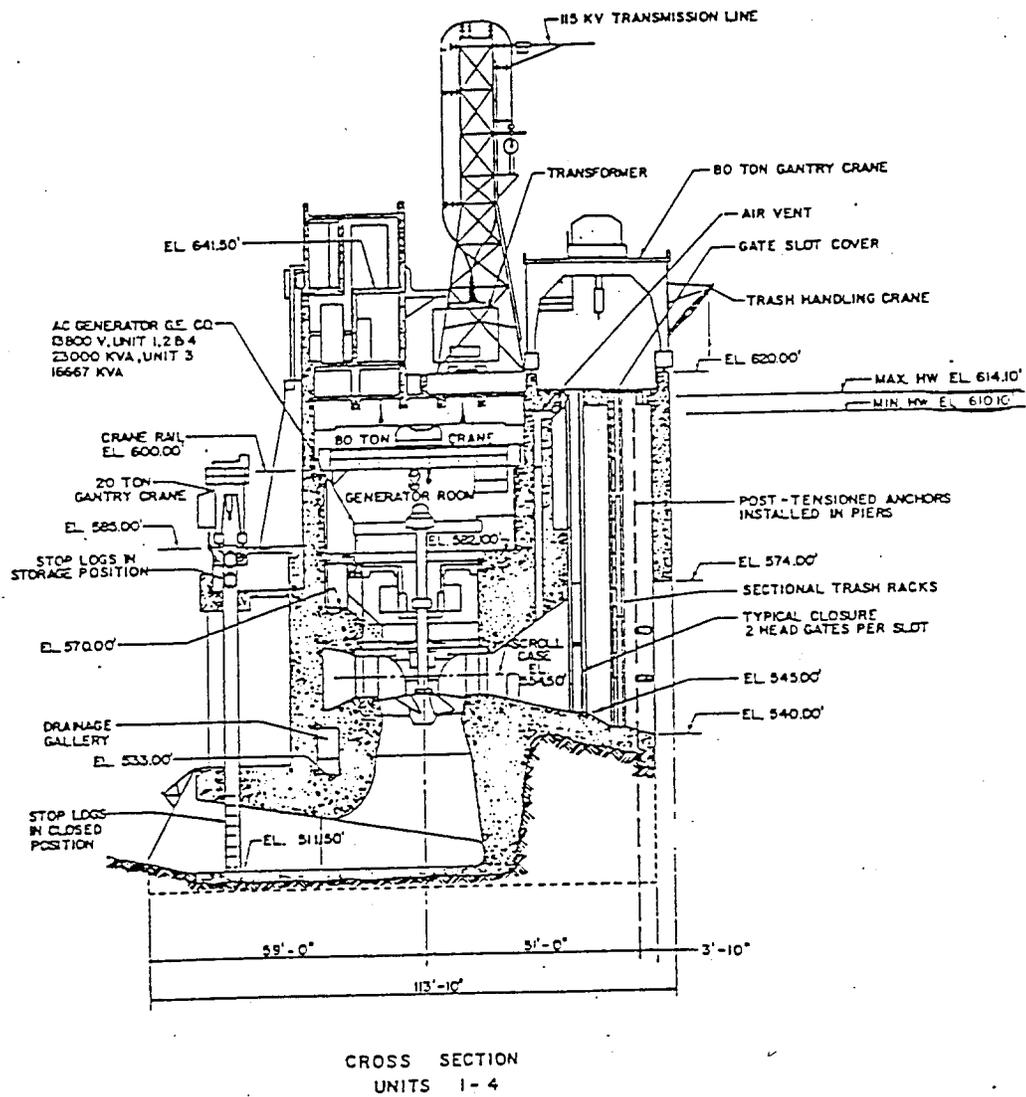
Rock Island dam Powerhouse 1 cross-section at fixed-blade propeller unit (Source: CCPUD 1973).
